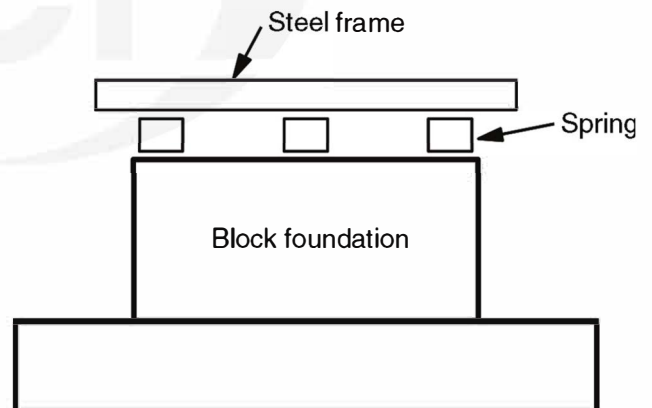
Spring-mounted equipment on block foundation.
